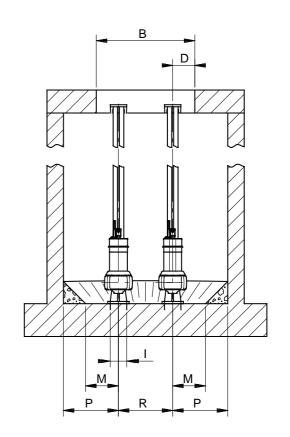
Dimensional sketch, two-pump installation on auto-coupling system
